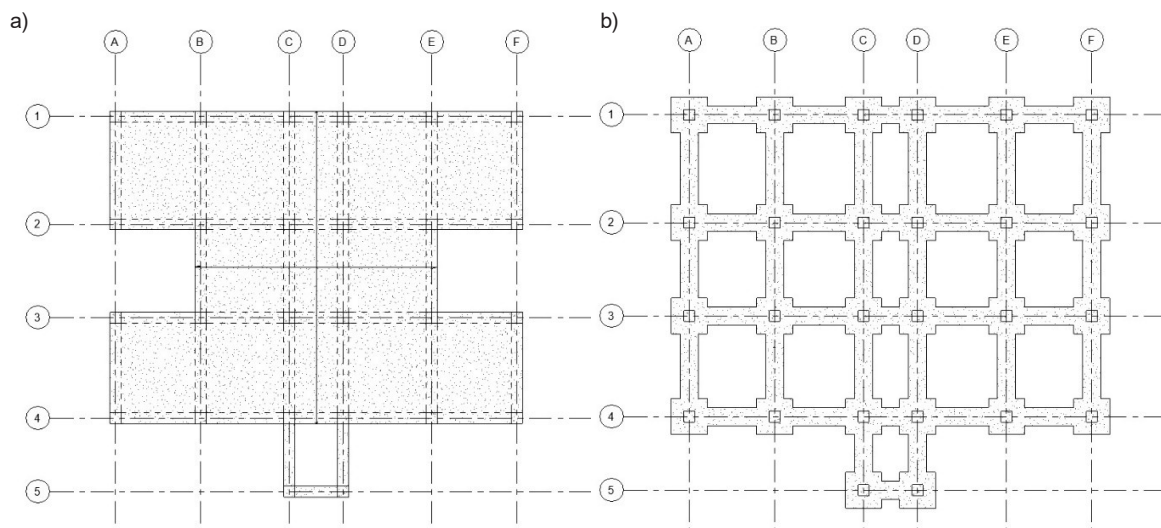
(a) Reinforced concrete slabs of the ceilings, (b) foundation of the three models in Revit Structure software
